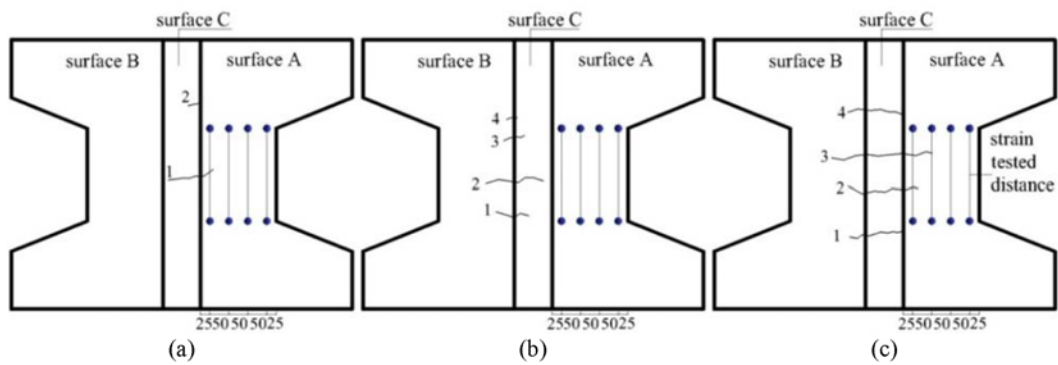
Distribution of Initial Cracks on RC Column Specimens: (a) Cracks in Specimen Z3, (b) Cracks in Specimen Z4, (c) Cracks in Specimen Z5
